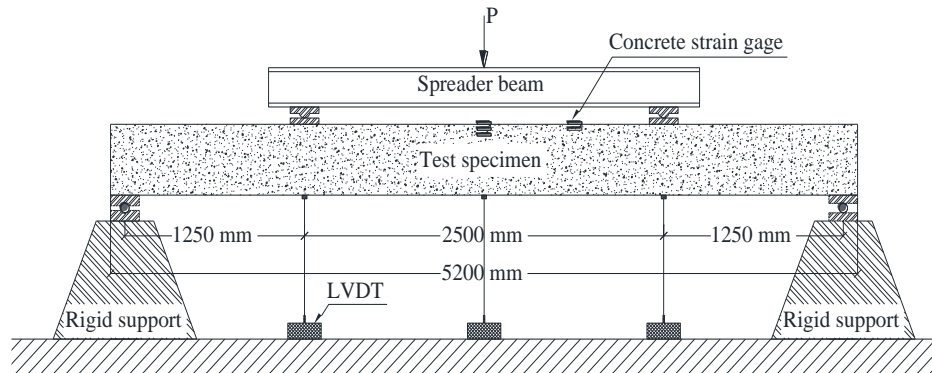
Test setup, and location of LVDTs and concrete strain gages
